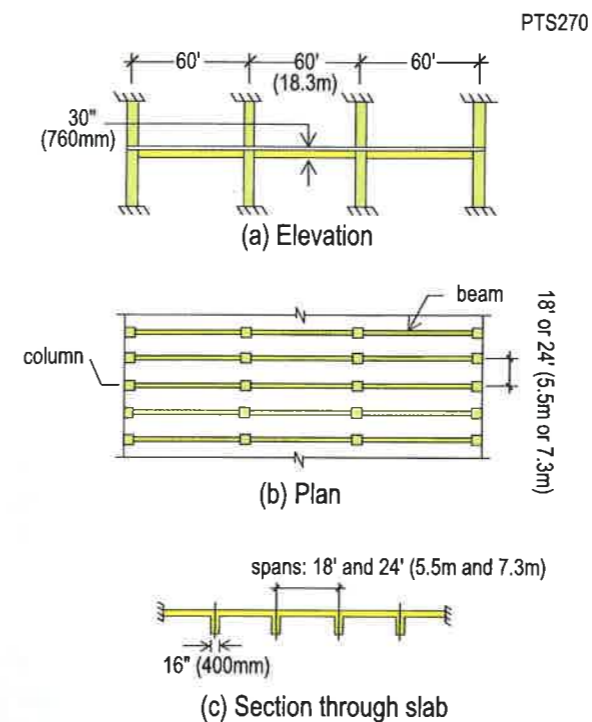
Typical Dimensions of a Post-Tensioned Beam and Slab Parking Structure Frame in USA
